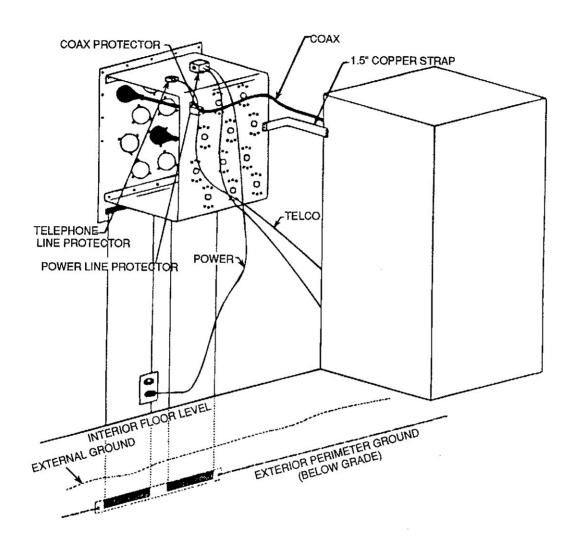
Typical Bulkhead Panel System, Inside View (Courtesy PolyPhaser Corp.)
